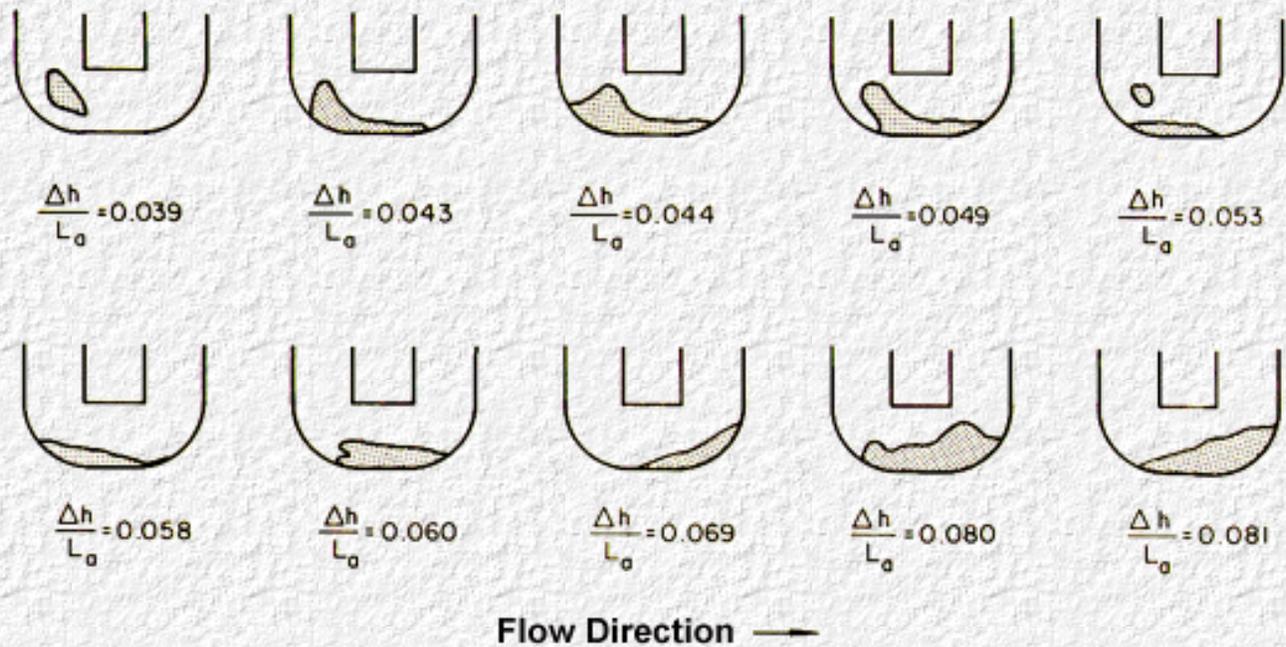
Zones of Failure on Riprapped Abutments
